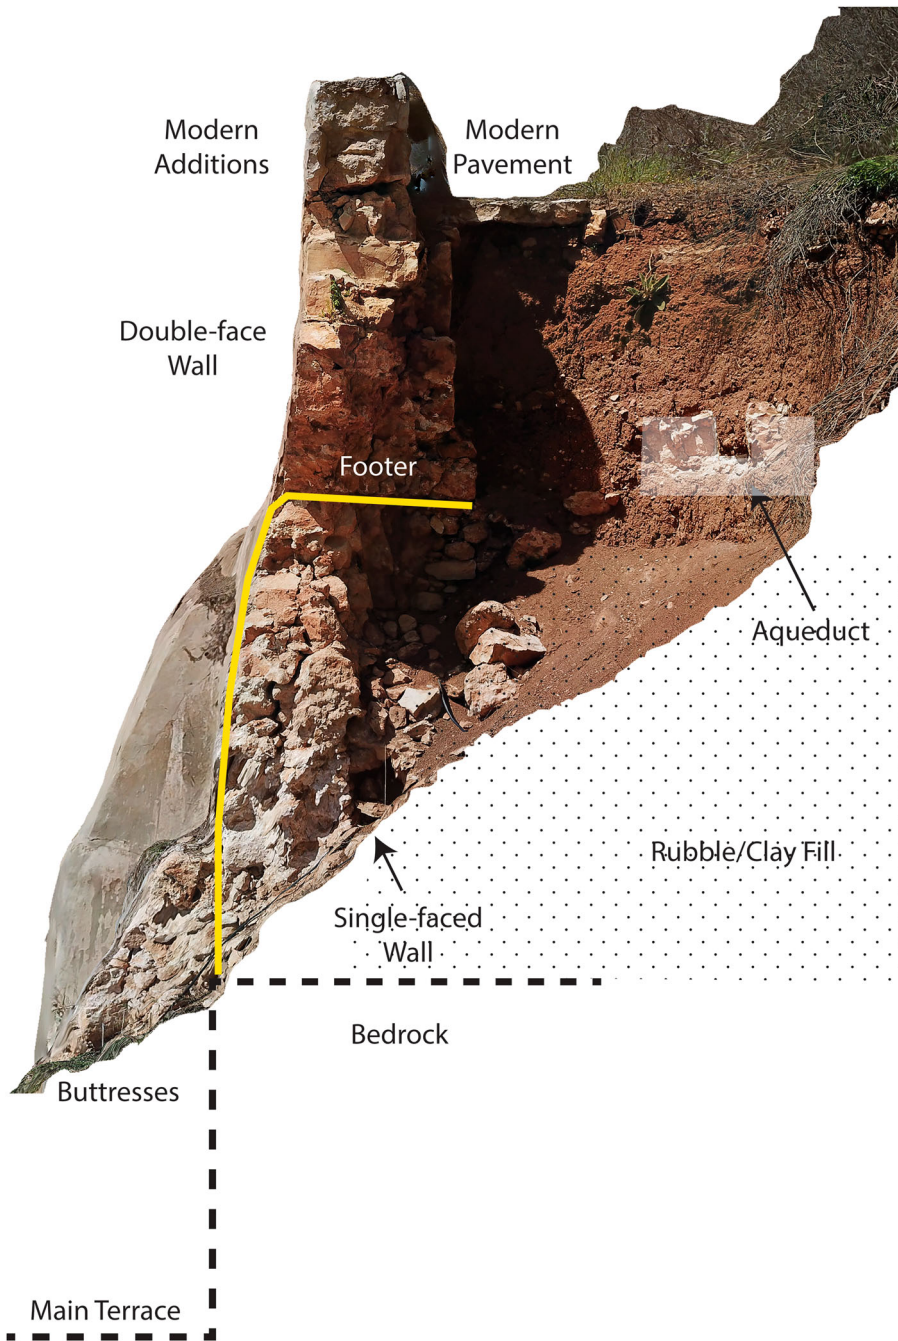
Strata in collapse of northern wall. At bottom, the ‘single face wall’ is the earliest discernable at this location, due to debris still covering the lowest portions. This single-face wall is of a revetment style, built up against a cut section of earth and meant to support it. The ‘double-face wall’ was designed as freestanding, and thus earth built up against the outside of it is stratigraphically later.
